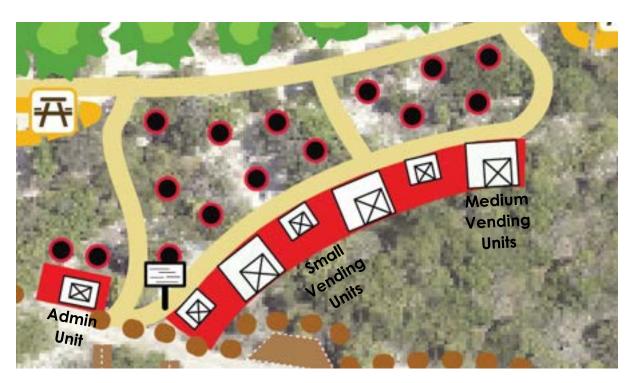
Long Bay, Beef Island Spatial Plan – Vending Zone Site Plan
